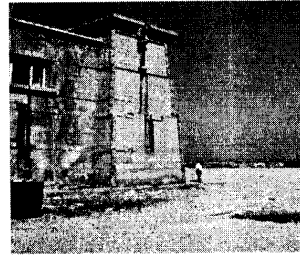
Cracks in the building of King Farouk Rest House, open fracture in the surface soil is noticed
